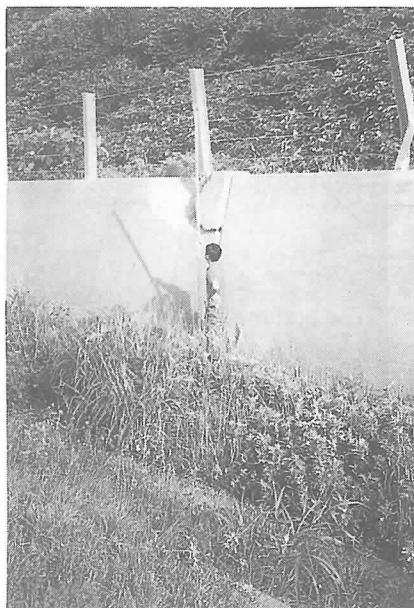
Broken root concrete of falling stone protection fall (concrete retaining wall, Shimamaki)
